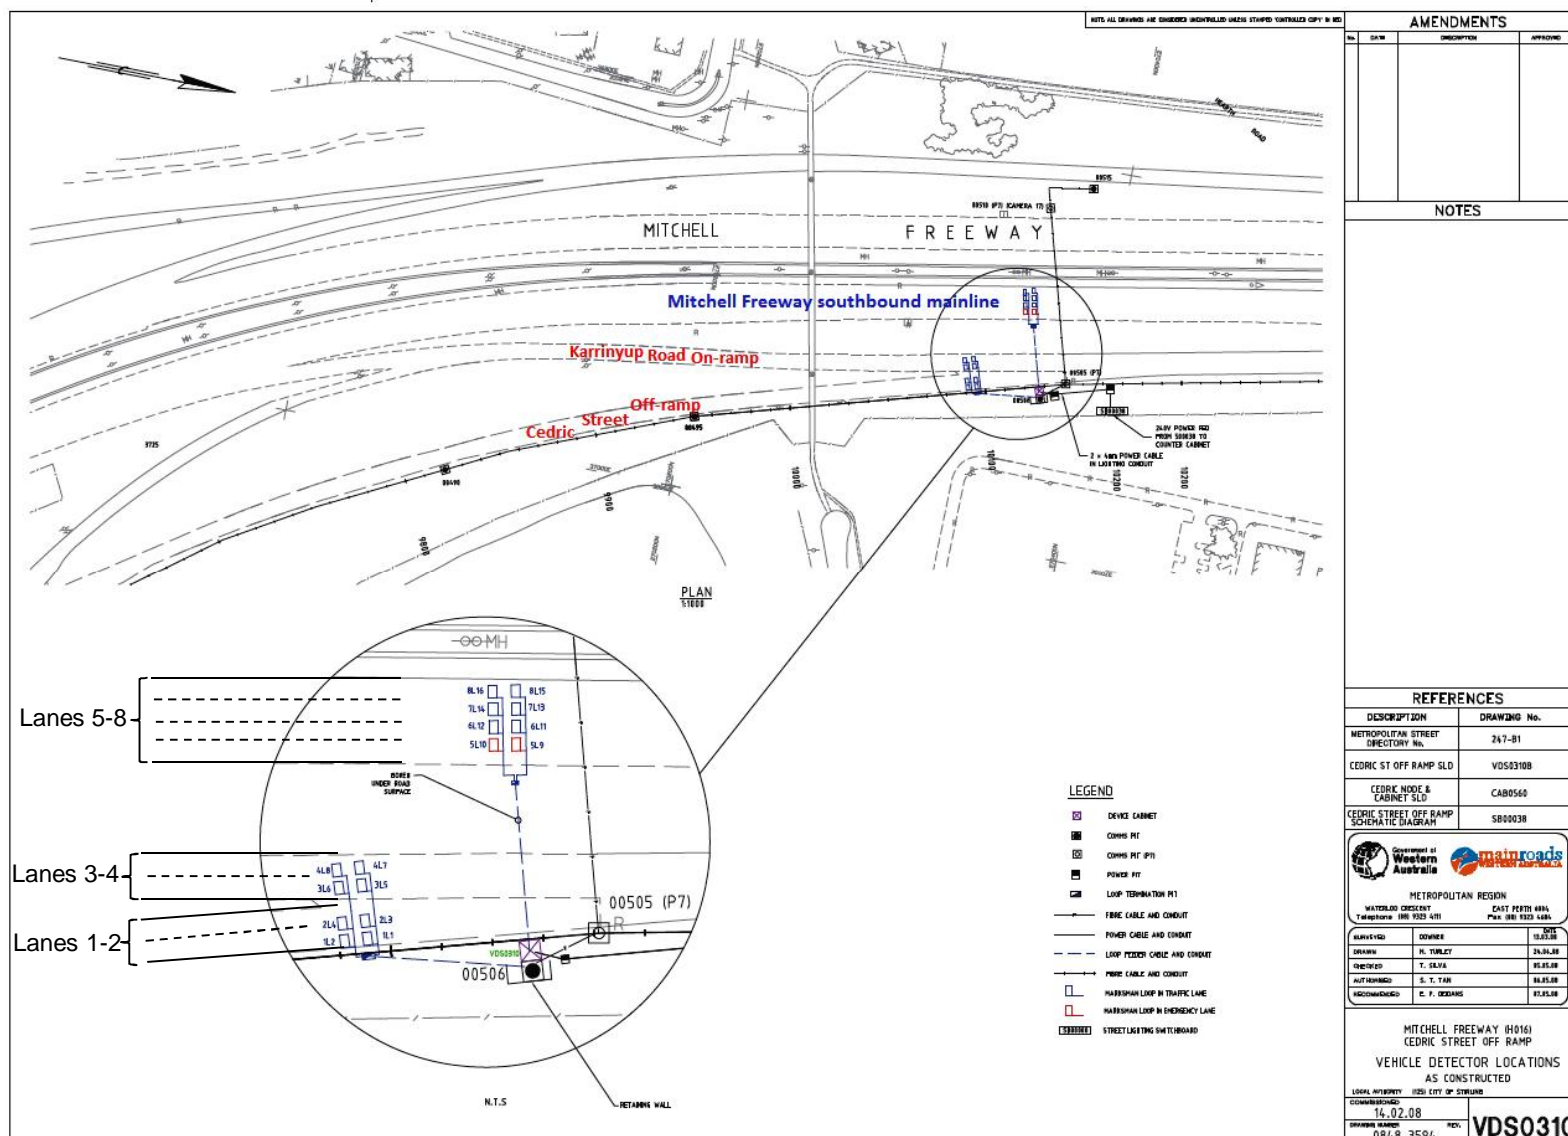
VDS 310 located on Mitchell Freeway, Karrinyup Road on-ramp, and Cedric Street off-ramp
